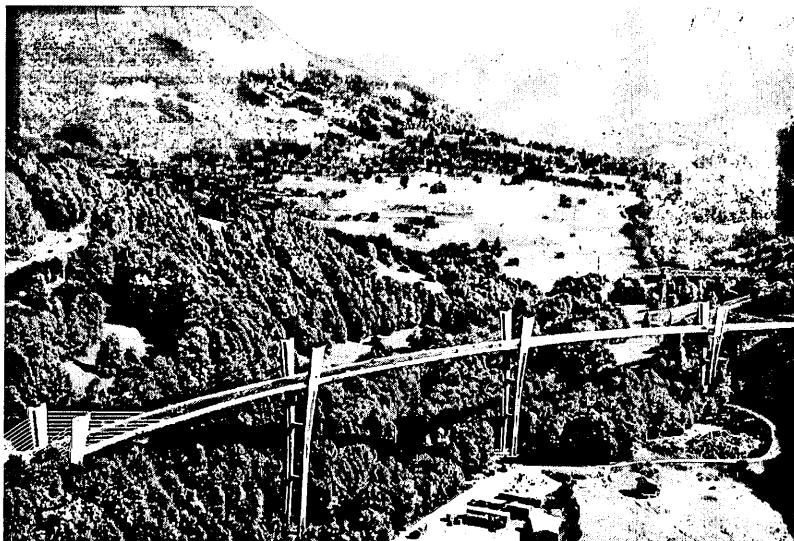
Sunniberg Bridge. A low cable-stayed bridge on slender columns.
